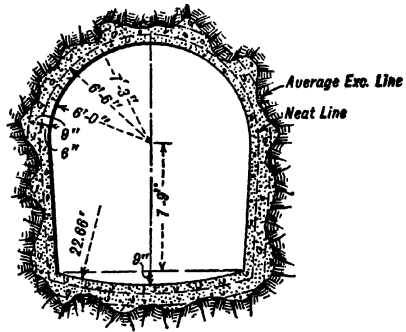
Tallulah Falls Tunnel. Georgia Railway & Power Co.
